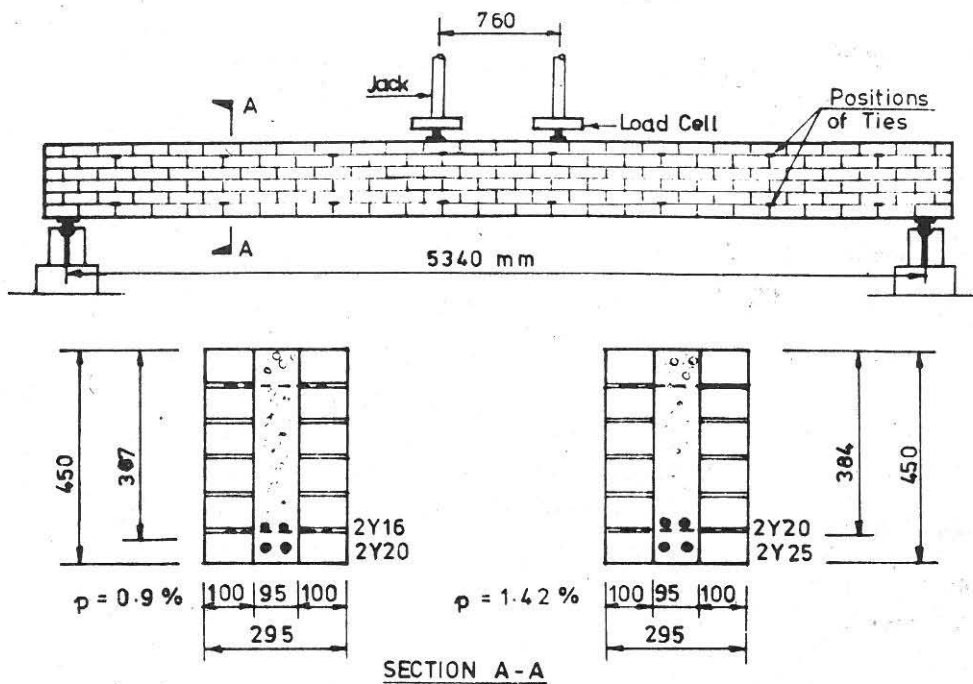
BEAM CROSS SECTION AND BRICK BONDING ARRANGEMENT
